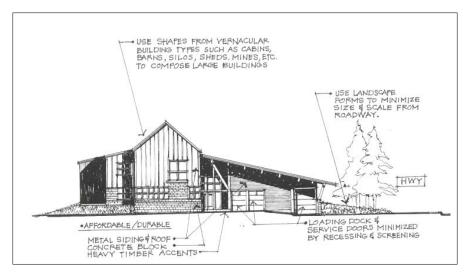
Example of desired building orientation, vernacular design, gateway landscaping, and screening of loading/service areas.
